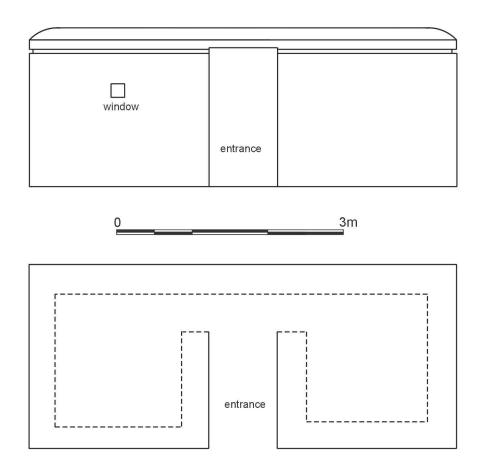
West facing elevation and plan of air raid shelter in garden of Half Acre
